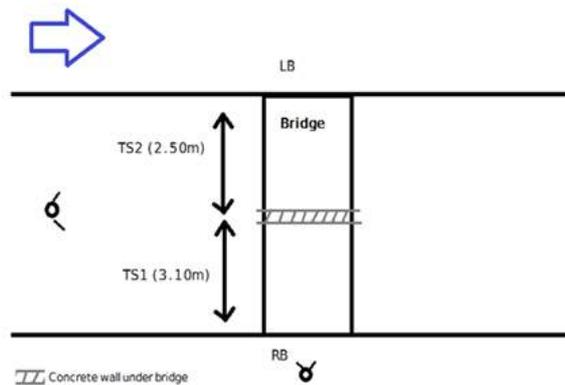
Site Plan of Mogden Sewage Works Barrier 1
